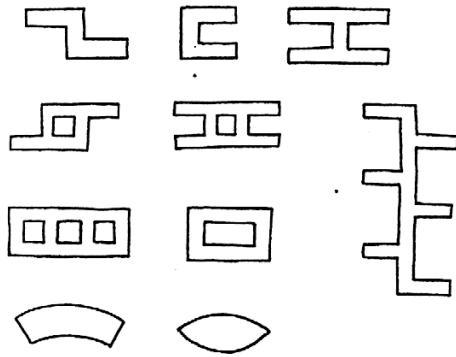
Plans Consisting of Long, Narrow East-West Strips
